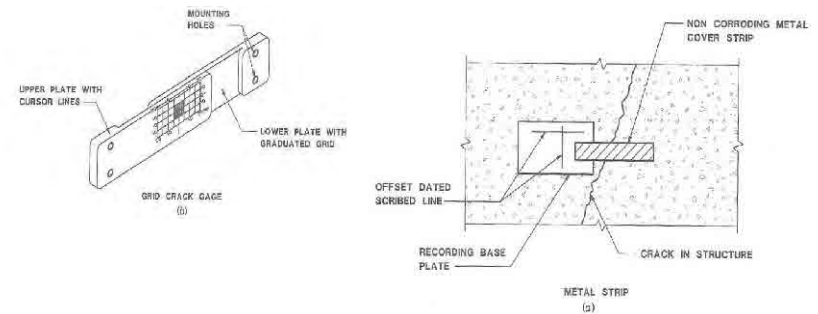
Manual Crack Gauge (a) Grid Crack Gauge, (b) Metal Strip
